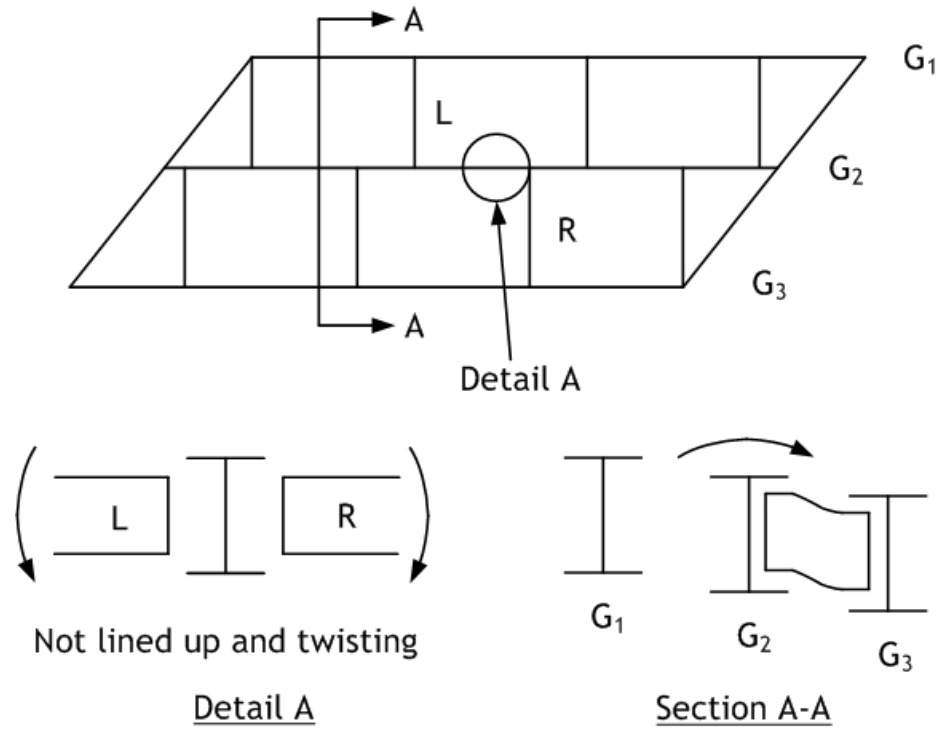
Skewed Bridge Producing Out-of-Plane Bending due to Differential Deflection of Floorbeams and Girders
